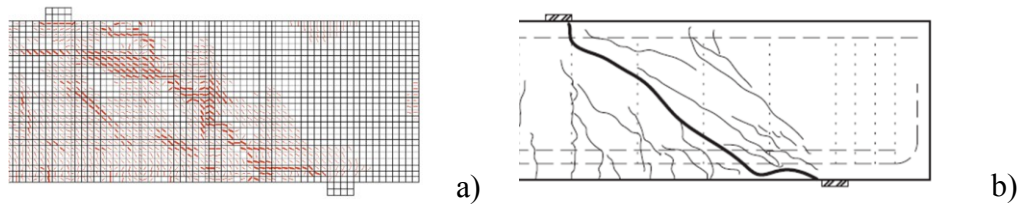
(a) Cracking generated by finite element model at failure; (b) Cracking map at failure for test specimen (Higgins et al. 2003)
